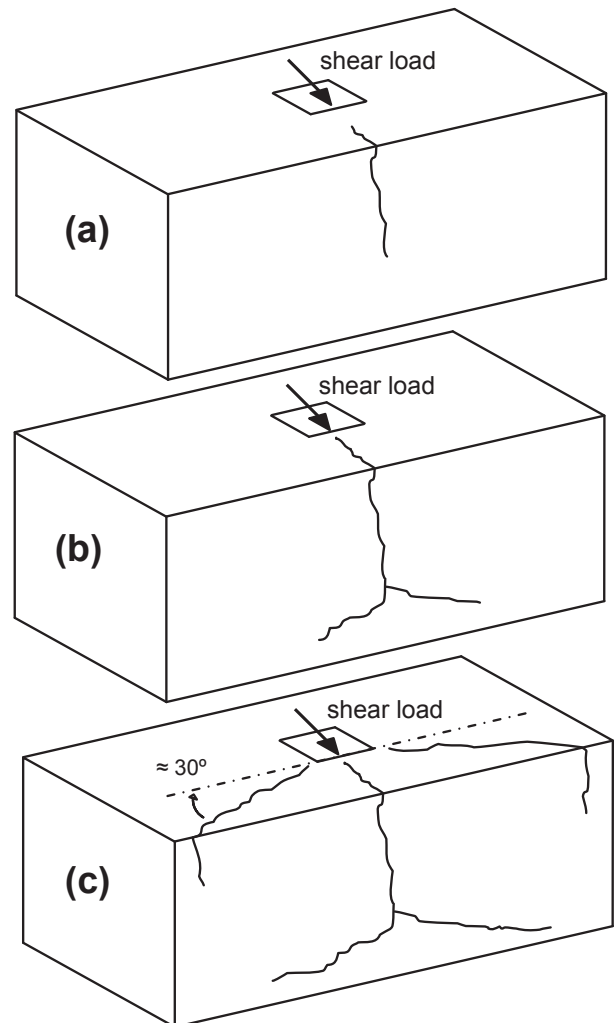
Damage progression for shear key test 6: (a) 0.066-in. slip; (b) 0.144-in. slip; (c) 0.246-in. slip.
